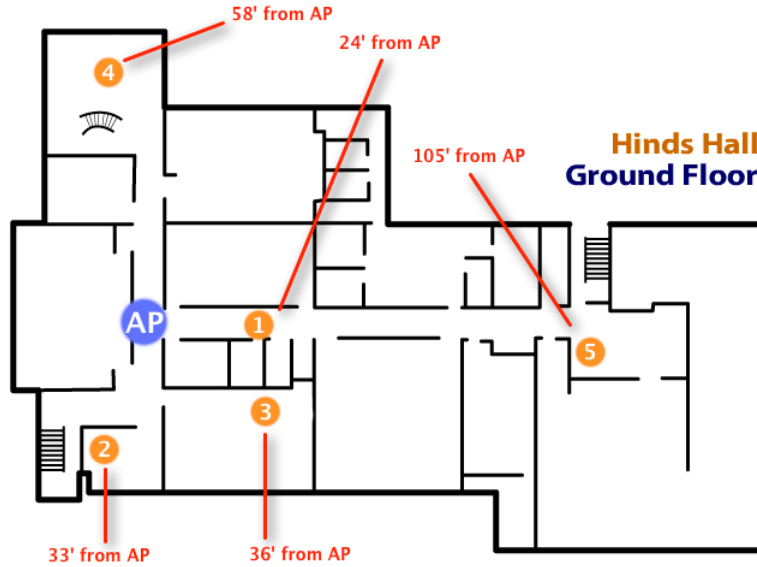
Floor plan of Hinds Hall with locations of Test 1 APs
